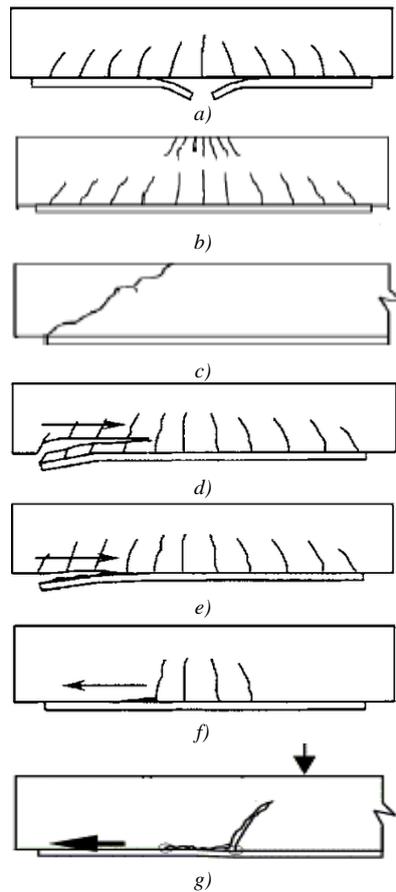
Failure modes of FRP flexural strengthening or repair [a) FRP rupture, b) Concrete crushing, c) Shear failure, d) Concrete cover separation, e) Plate end interfacial debonding, f) Flexural crack-induced interfacial debonding, g) Flexural-shear crack-induced interfacial debonding] (Ritchie et al., 1991; Saadatmanesh and Ehsani, 1991; Triantafillou and Plevris, 1992; Sharif et al., 1994; Chajes et al., 1994; Heffernan and Erik, 1996)
